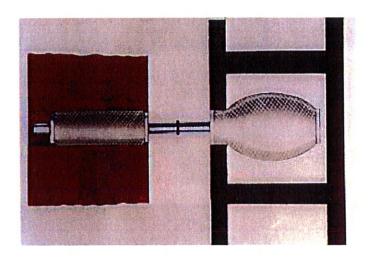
PHOTO: CINTEC RAC FIXINGS FOR BRICK CAVITY WALL THE CHURCH OF SAINTE-ANNE d'Ottawa was built in 1873 on Old St. Patrick Street. In the fall of 1893, the church was extended by the addition of the transept wings and the reconstruction of the sanctuary. The new church was inaugurated on February 25,1894. In 1967, major renovations to the church were carried out. These repairs included repairs to the main roof trusses, the replacement of the timber floor in the church with a reinforced concrete slab and the addition of a basement below the sanctuary, including a mechanical room. The building was designated a heritage property in 1978 by the City of Ottawa, in accordance with provincial heritage legislation.
